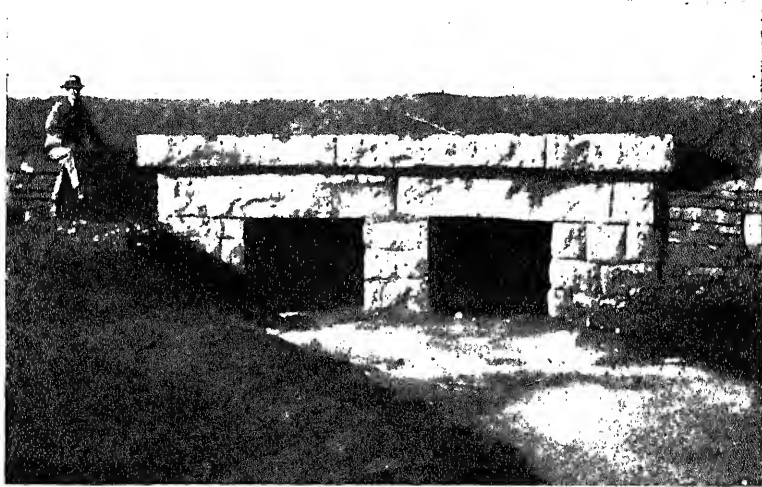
Double Box Culvert. Openings 4 by 3 Feet
